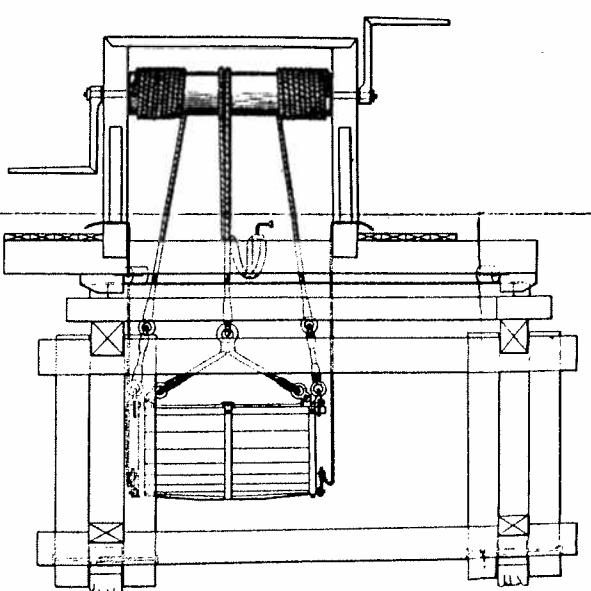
Frontal view of sheet section. a. bolt ; b. brace.
